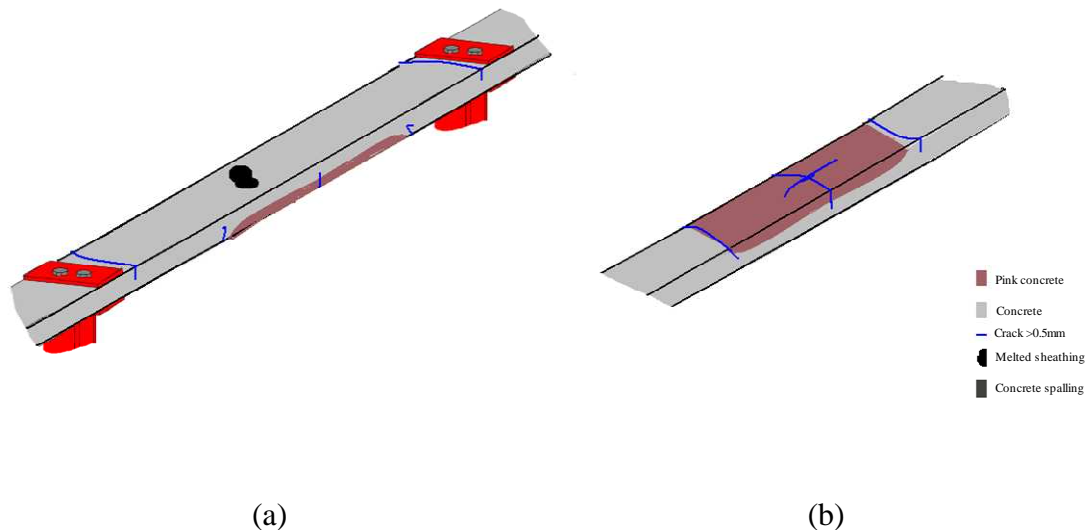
Cracking and heating pattern of Slab C centre span (a) unexposed surface view (b) exposed surface view (upturned).
